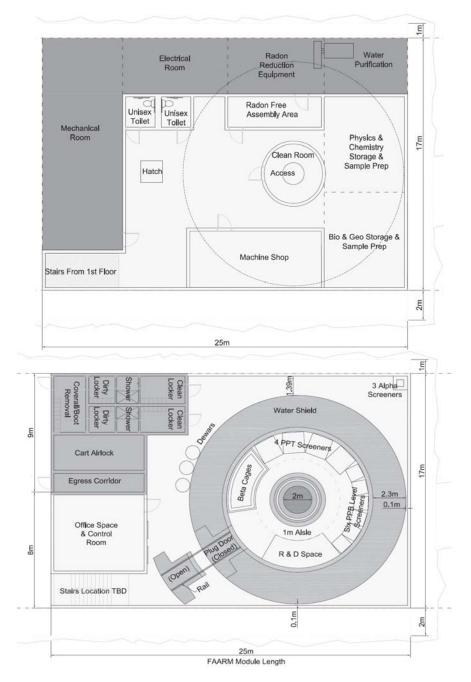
Floor plan for the DUSEL 4850' level Facility for Assay and Acquisition of Radiopure Materials, or FAARM.
